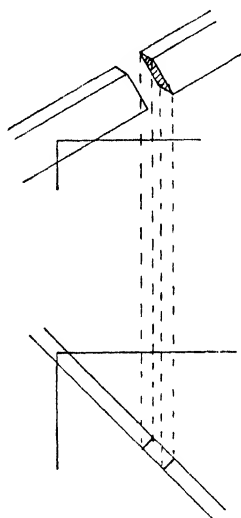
Sketch showing how the true Section of a Hip Rafter is not shown in Plan.
